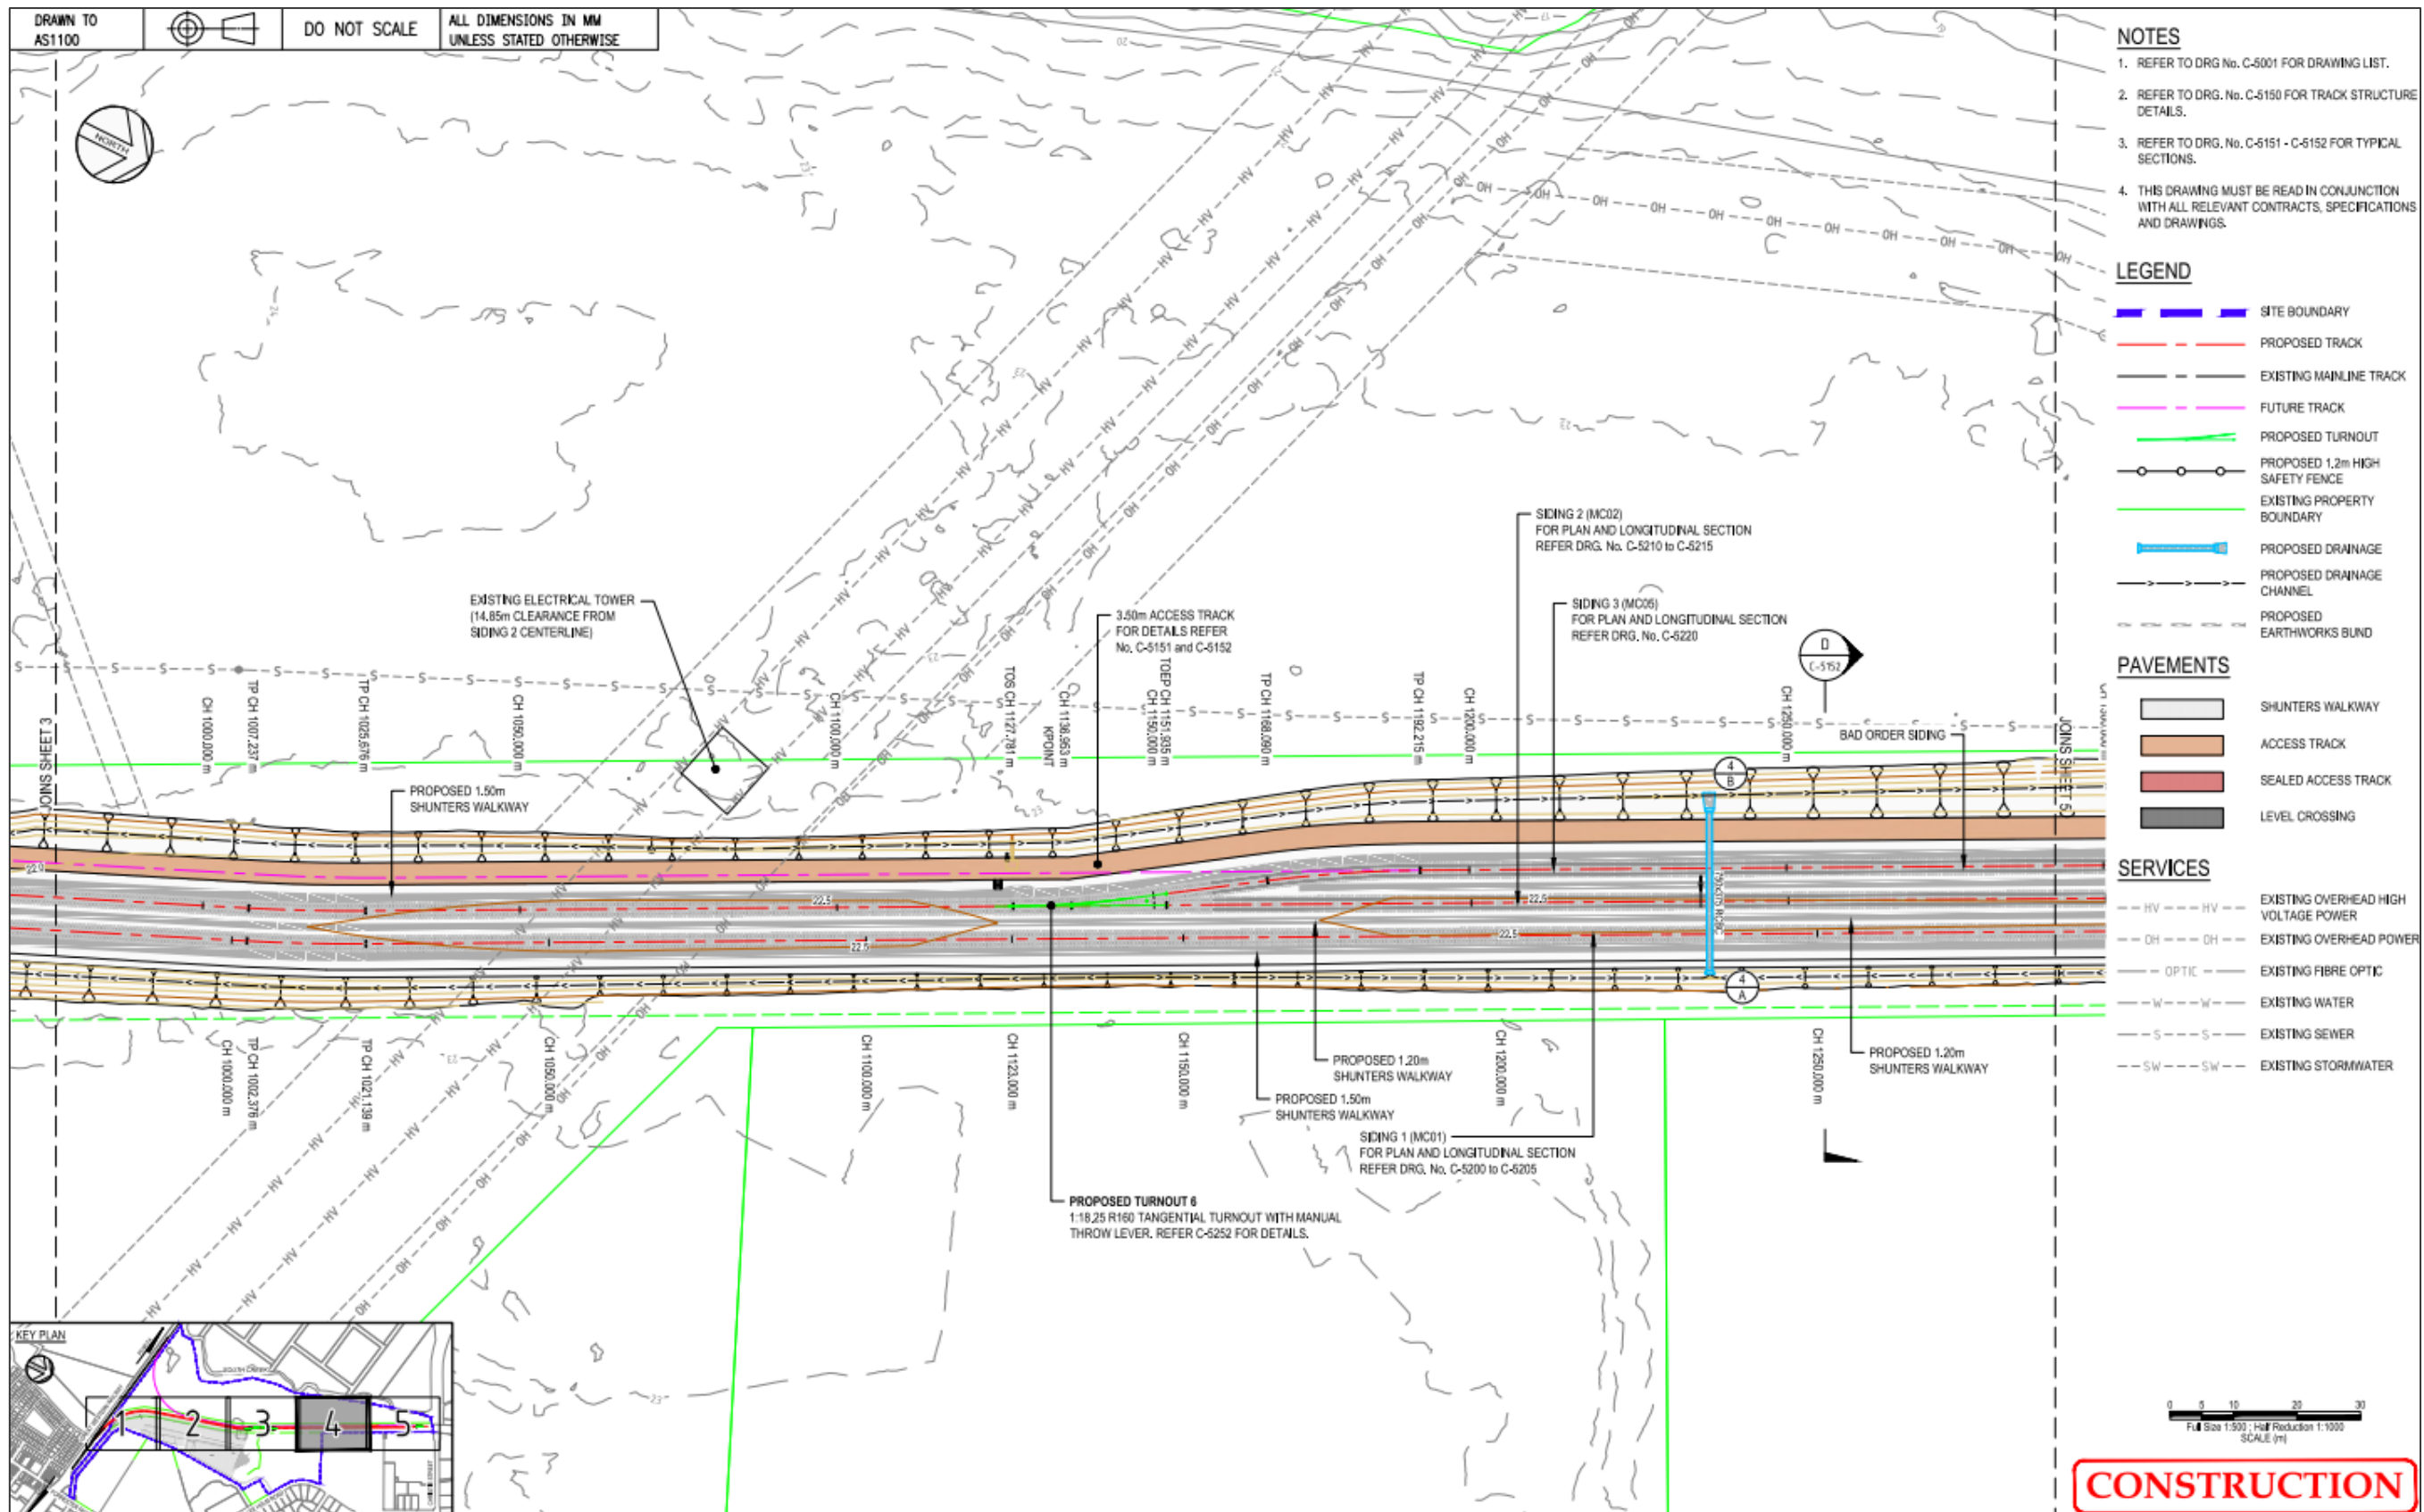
| Rail refurbishment works engineering drawings – Sheet 04 of 05 (Source: Applicant's Modification Report)
